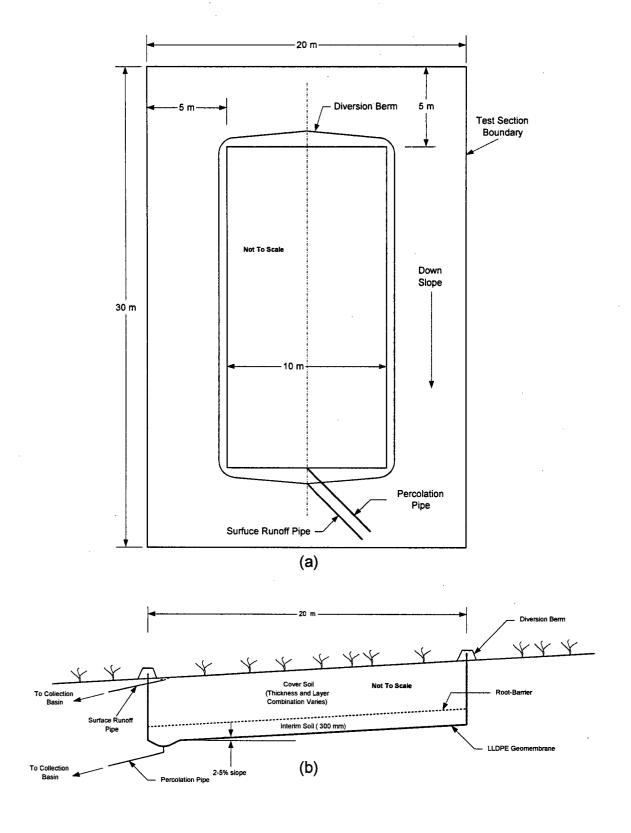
Schematic of ACAP Test Section and Lysimeter: (a) Plan View and (b) Cross-Section.
